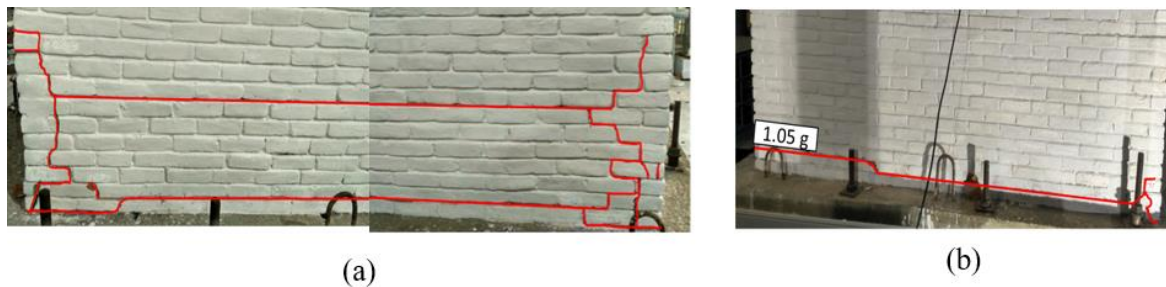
Cracks in the in-plane walls [a) north wall b) south wall]
